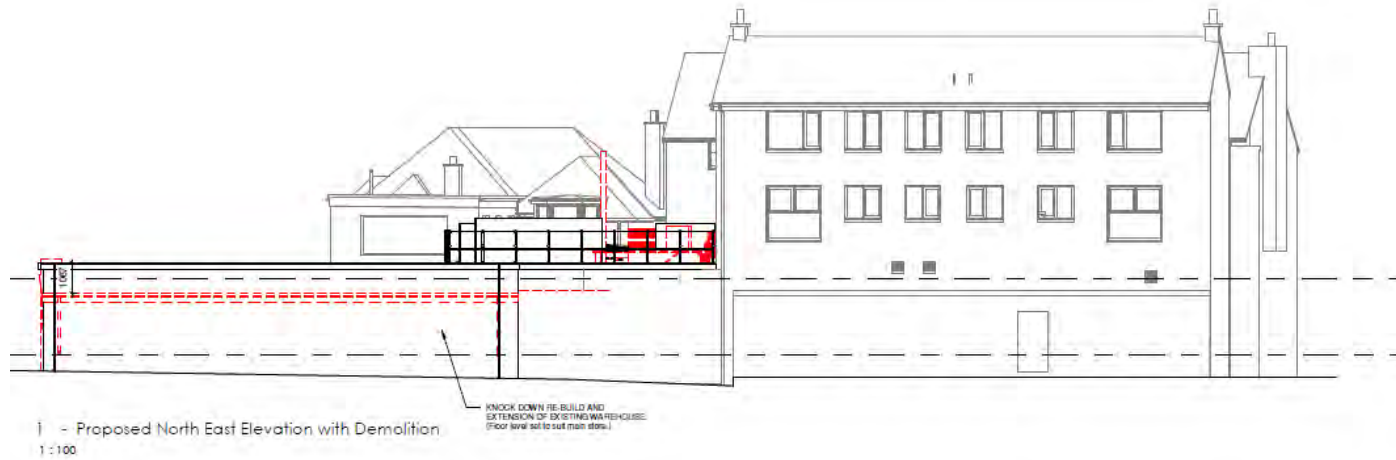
Extract from DWG No. A110-BOW-AO-ZZ-DR-A-0014 Rev. P3 – Proposed Elevations with Demolition – detailing demolition within the central and northern parts of the Site.
